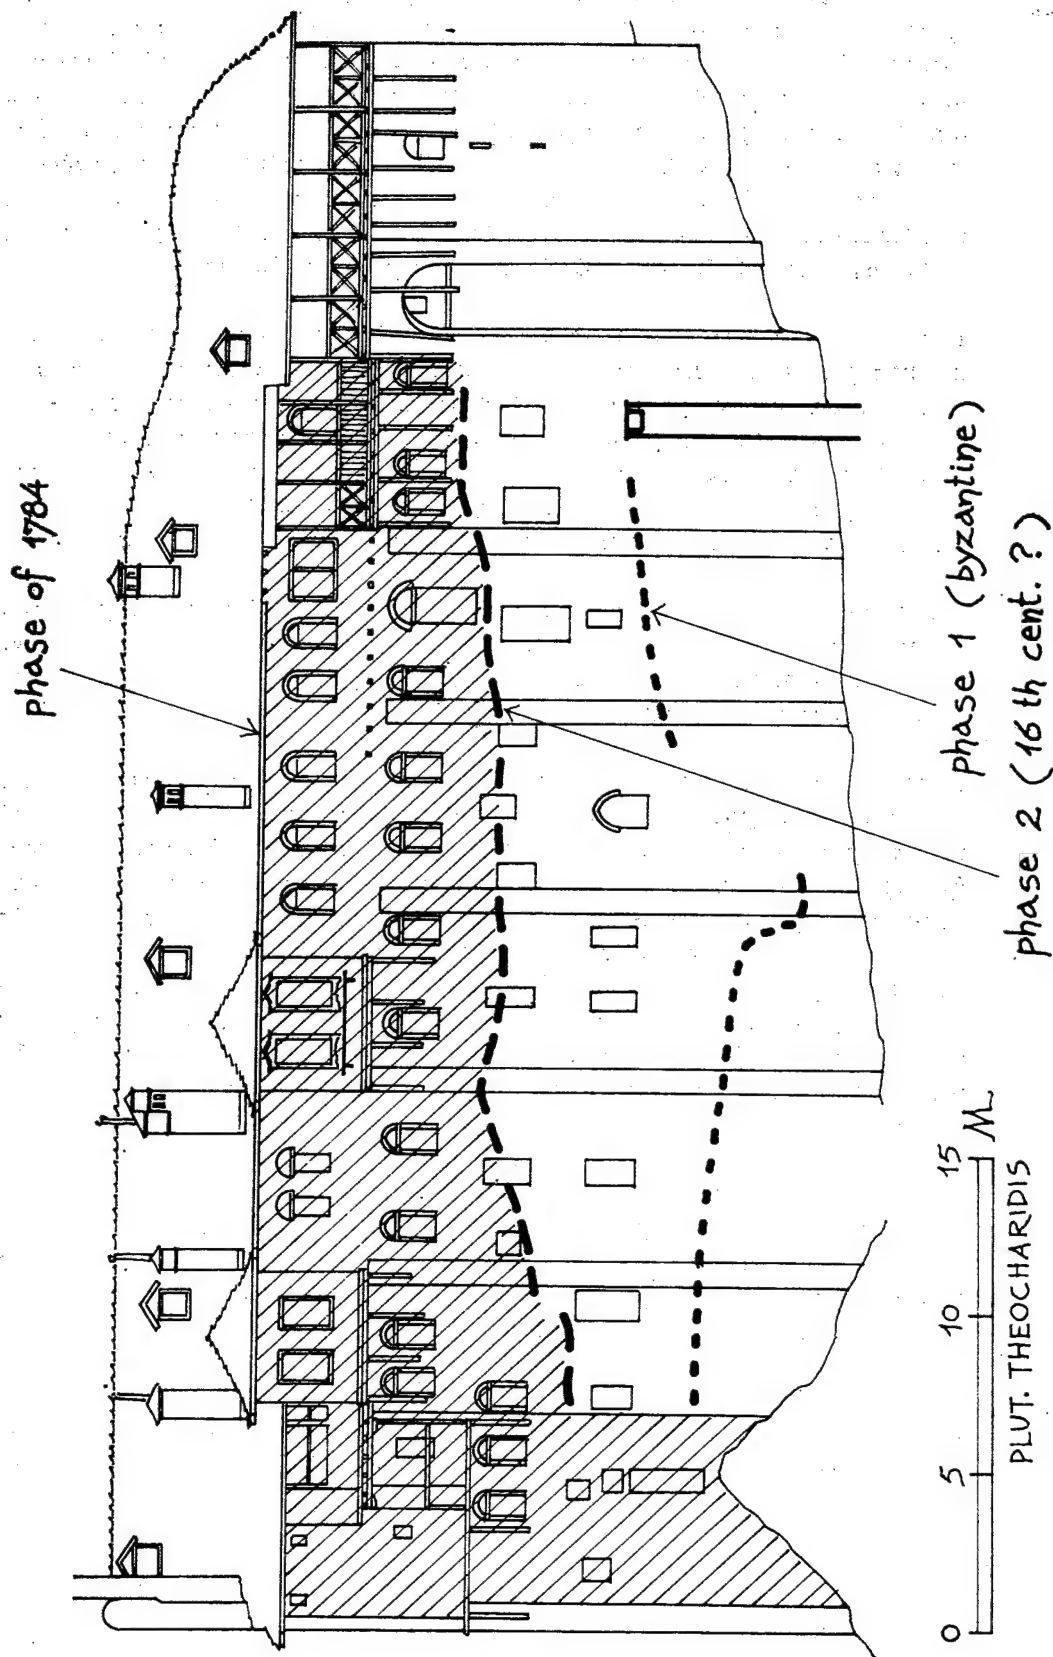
BUILDING PHASES OF THE EXTERNAL FACE OF THE SOUTH WING (THE BASIS-DRAWING IS FROM NENADOVIĆ, KONACI U JUŽNOJ MALI, FIG. 7).
